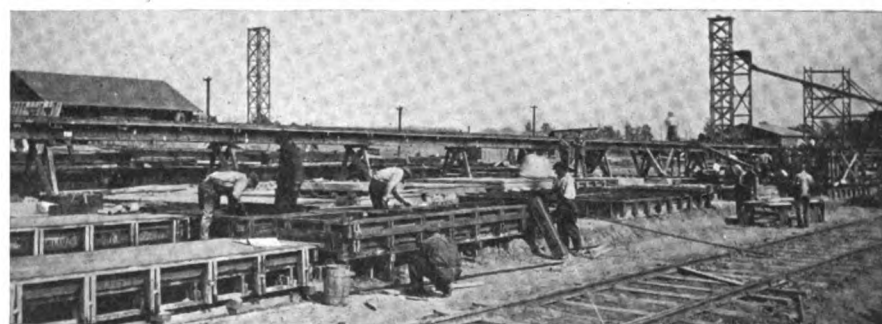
CASTING YARD; TRACK FOR LOCOMOTIVE CRANE AT LEFT; CASTING AREA AND TRAMWAY AT RIGHT WITH TOWER IN BACKGROUND
